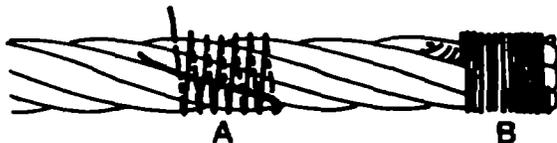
Method of Seizing a Wire Rope. At A the Turns of the Seizing Wire are Spread Apart to Illustrate the Method. At B the Completed Seizing is Shown.
